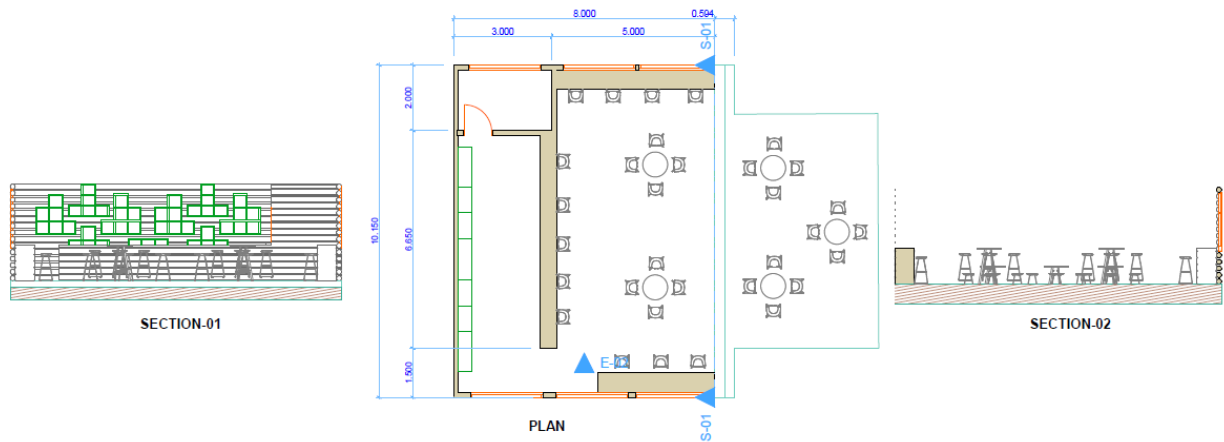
Bar Plan and Sections: (Image Source: Author)
